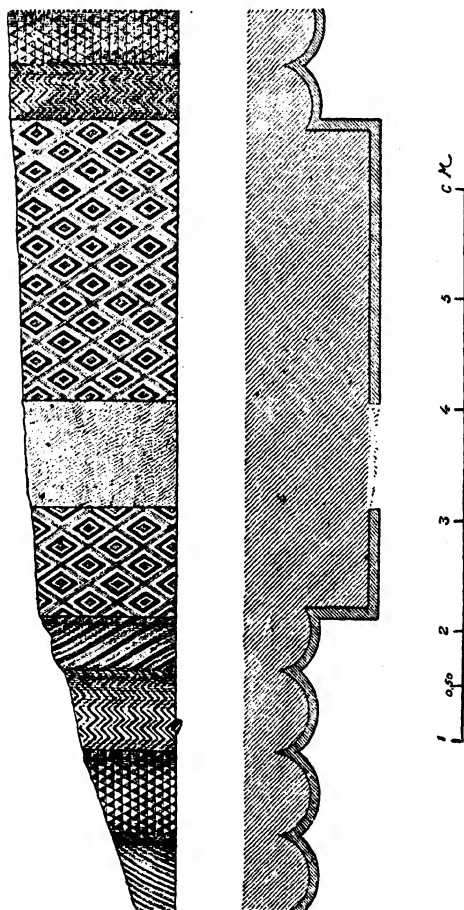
Plan and Elevation of Part of a Façade at Warka; from Loftus. (P. & C.)
